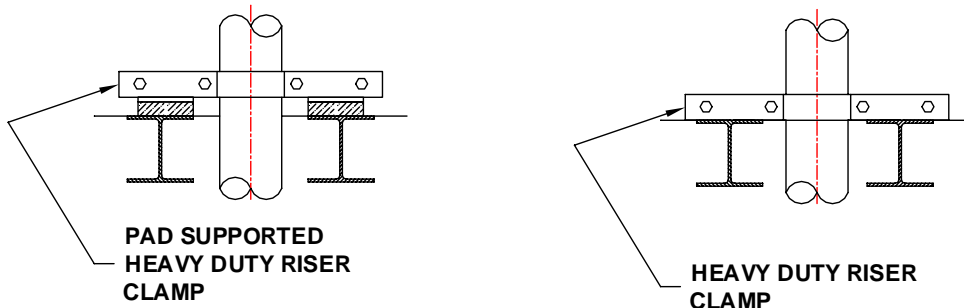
; Steel Supported Longitudinal Restraint for Vertical Pipe Run
